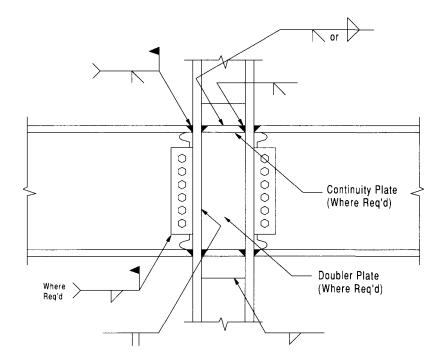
Prescribed Welded Beam-to-Column Moment Connection (Pre-Northridge)
